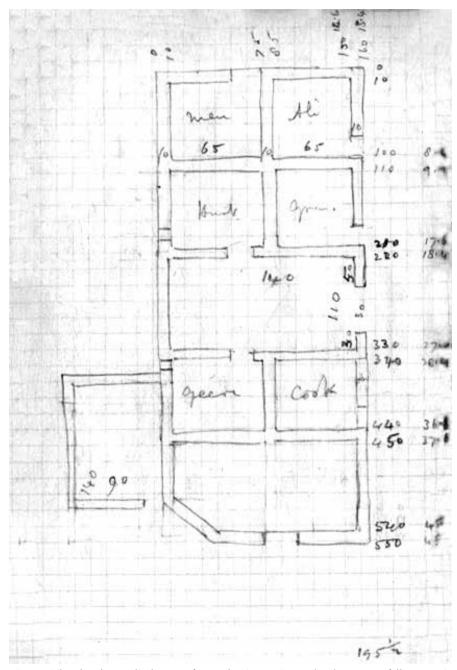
The al-Bahnasā dig house, after a plan in Petrie notebook 21. Grenfell's room is labelled "Gren.".
